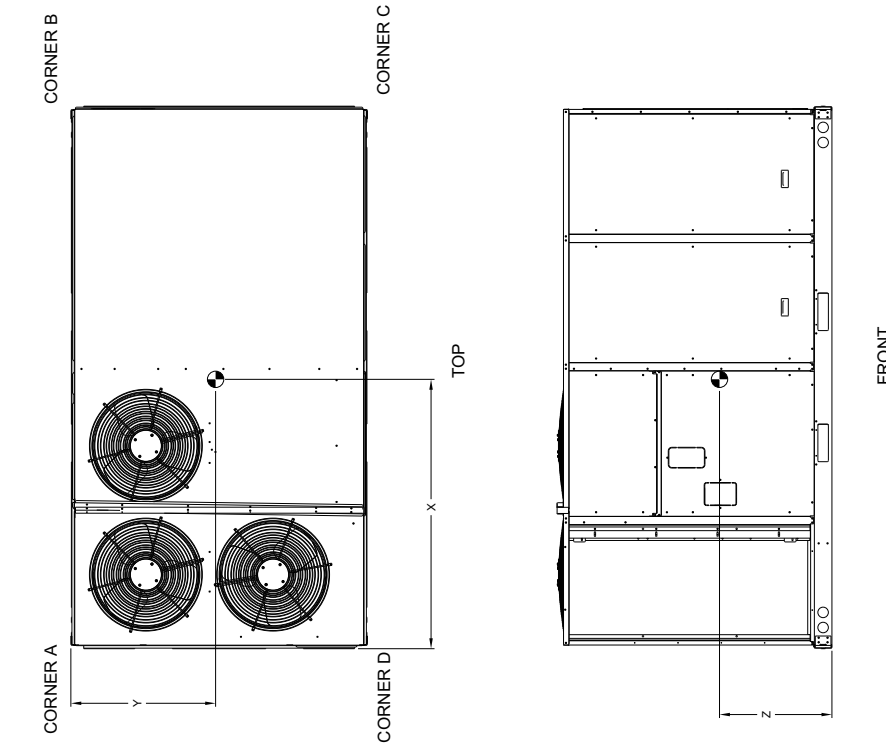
Unit Dimensional Drawing – 08 Size Unit
